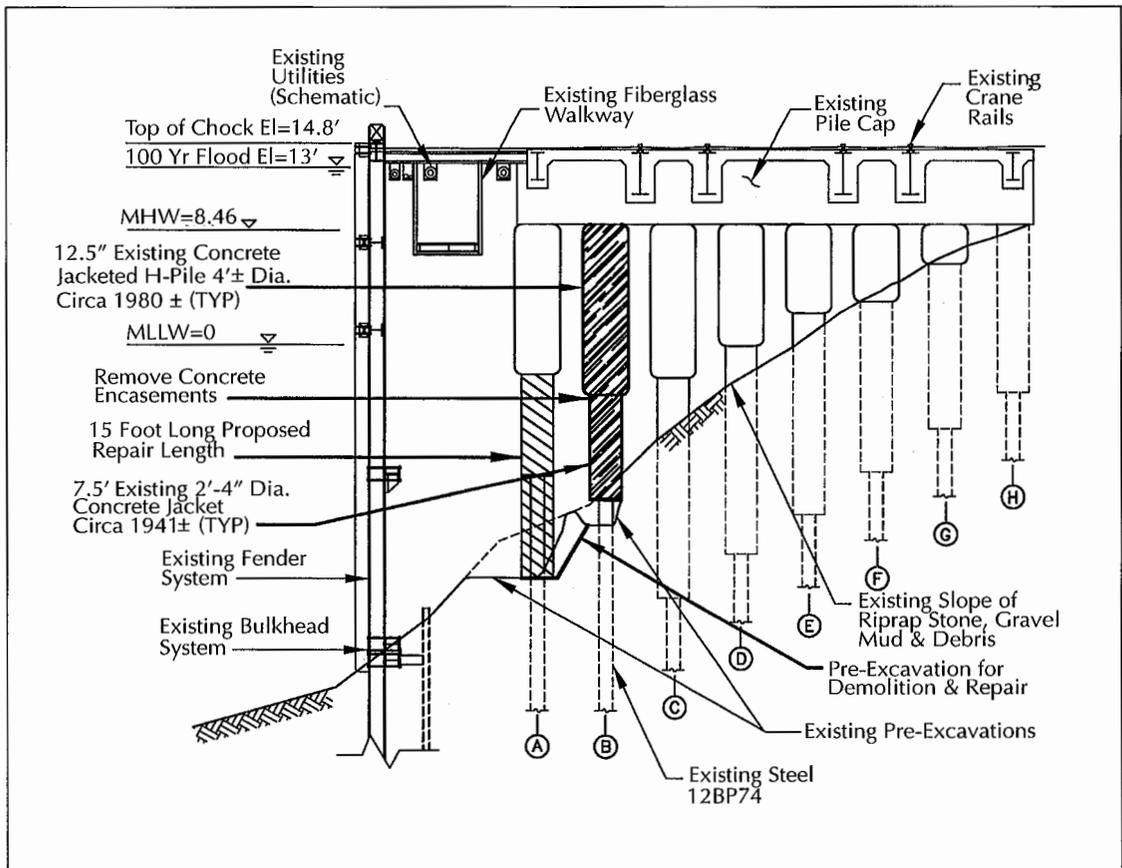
Concrete encasement/pile jacket repair (from a 1997 archive drawing).
